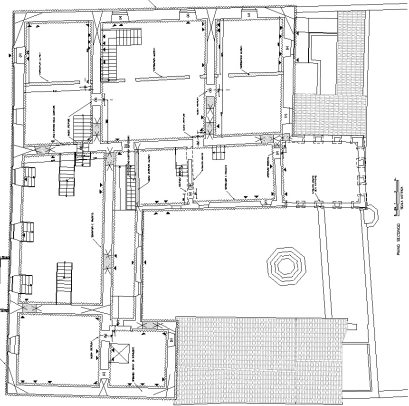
Typical plan illustrating the extent of the stone masonry wall replacement and repair.
